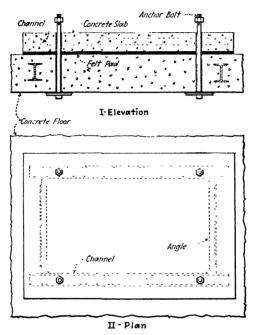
Isolated concrete-slab foundation on a concrete floor.
